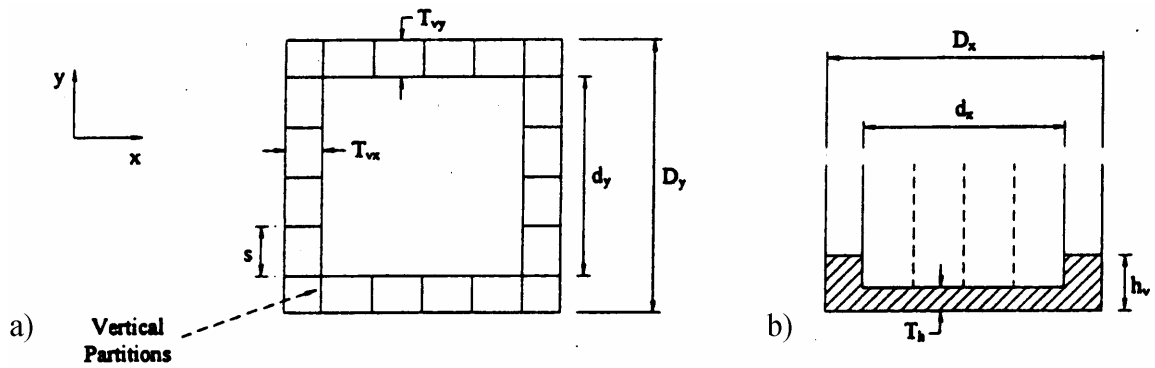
Bi-directional Tuned Liquid Column Damper: a) plan view b) front view, see Hitchcock et al.³⁷
